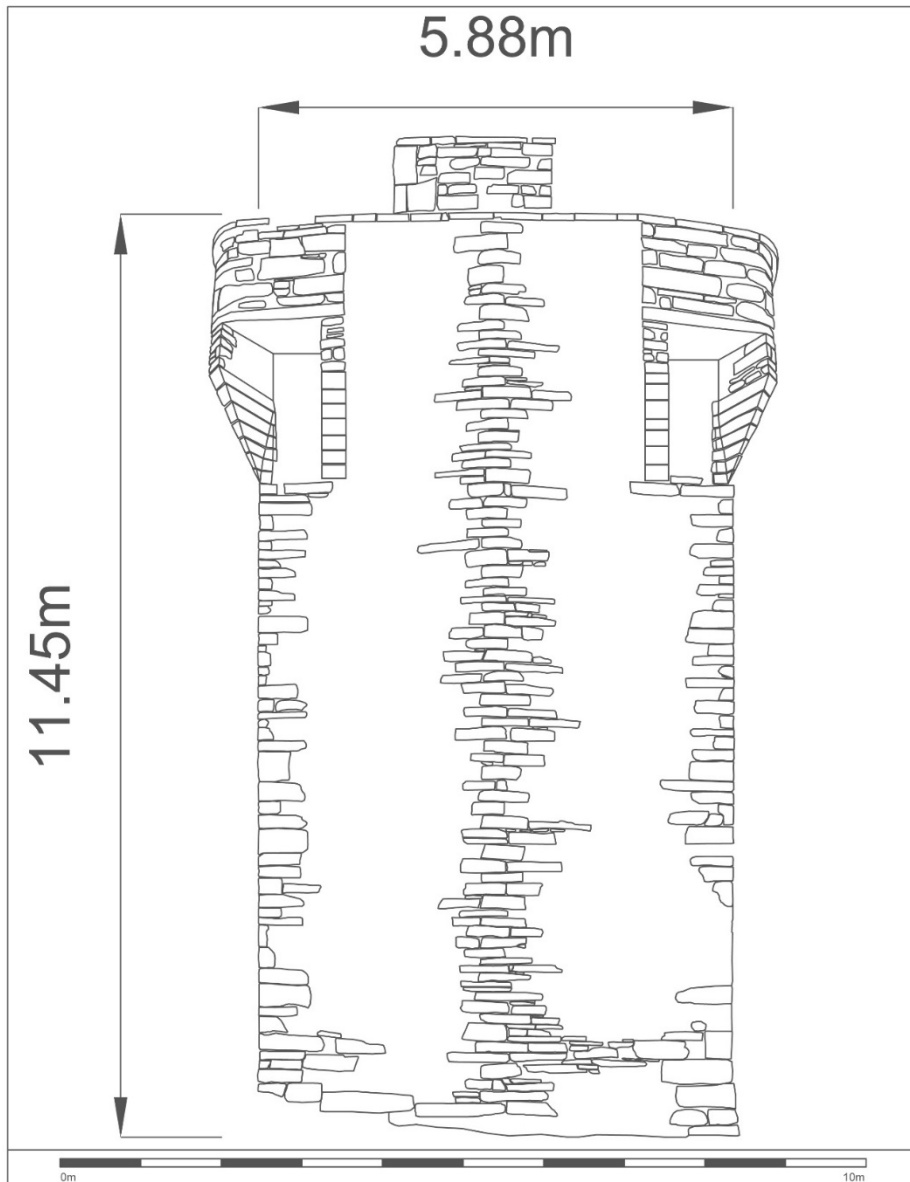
External elevation of the north-east wall of the signal tower at Malin Beg Signal Tower.
